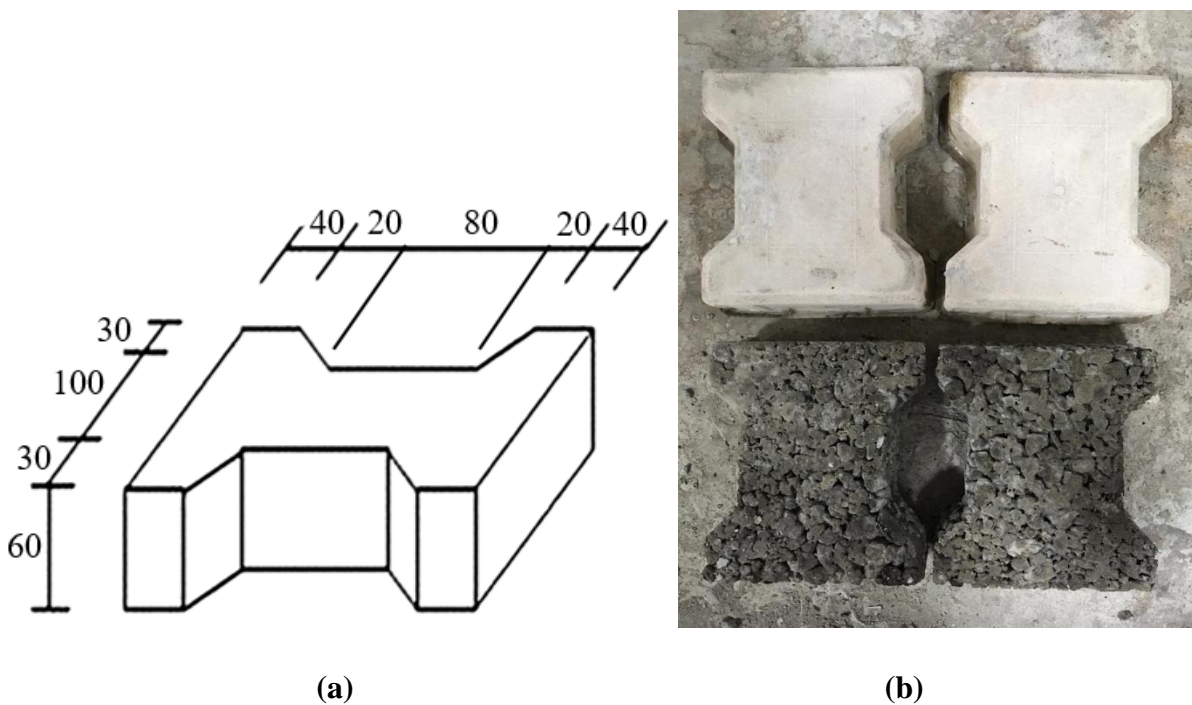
Interlocking tile specimen (a) Dimensions (b) After de-moulding
